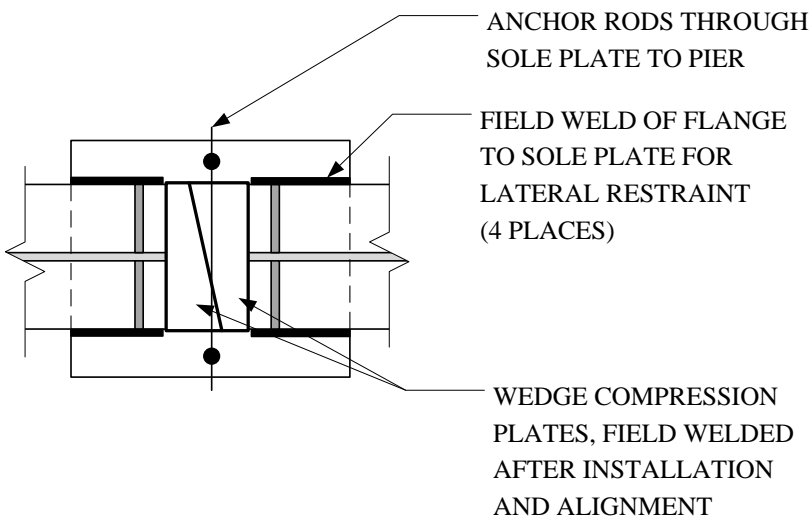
SMC Girder Support Detail 2 - Plan View
